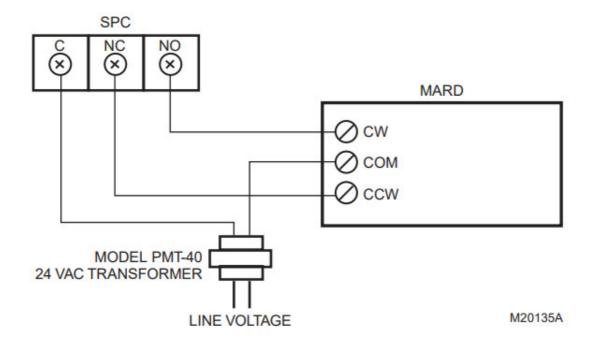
Wiring SPC to control MARD damper in bypass application.
